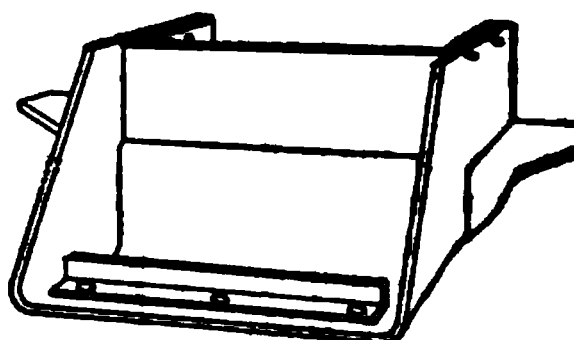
Duplex Extra-heavy Wall-hanger for Large Wooden Girders
